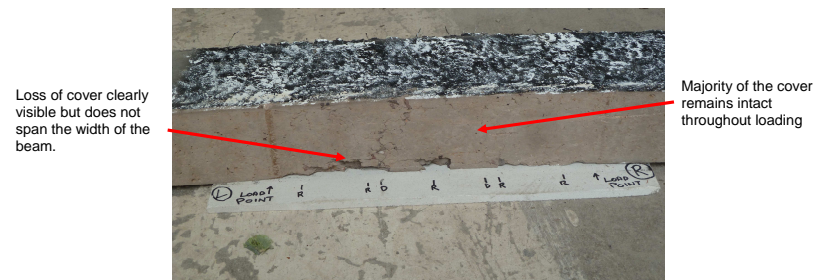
Photo: Beam of mix with macro synthetic fibres after mechanical and thermal loading. Shows some compression damage and only a little amount of concrete cover loss is sustained.
